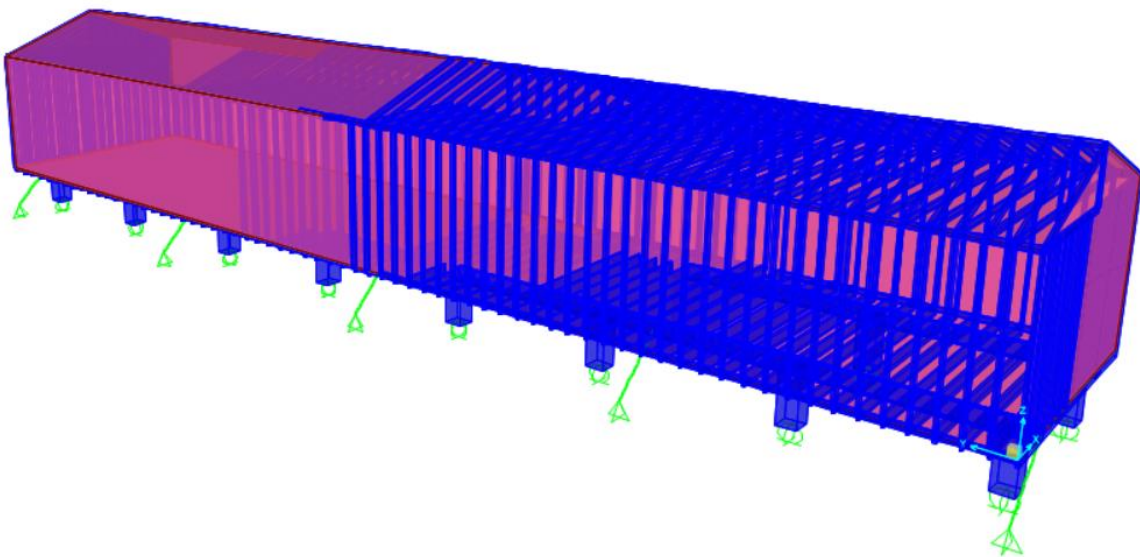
Typical layout of a manufactured home modeled in SAP2000
